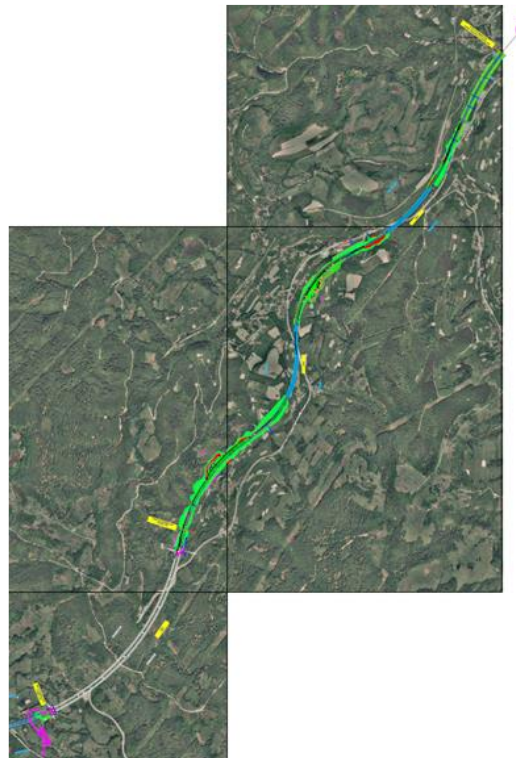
Layout of motorway section: Tarčin – entrance to Tunnel Ivan
